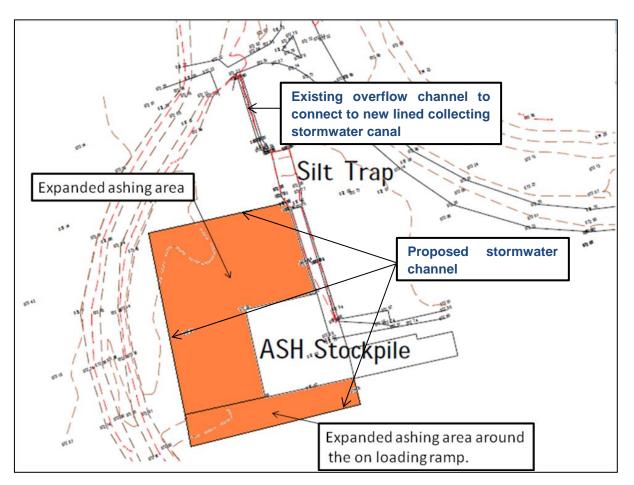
Proposed expansion and stormwater management of the emergency ash offloading area
